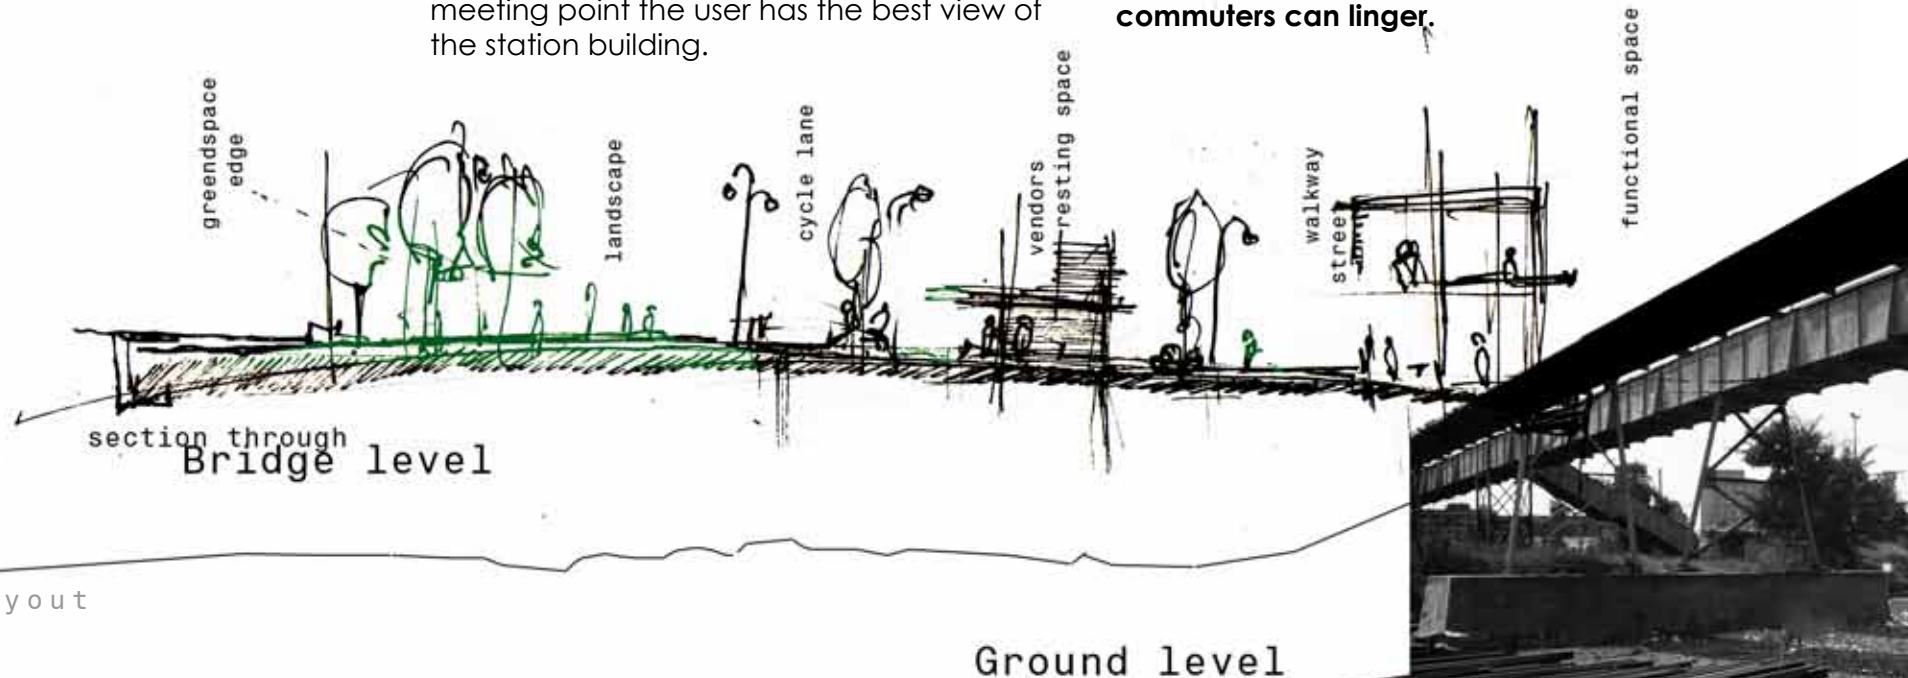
Proposed bridge design accommodating all users [Source: Author]
